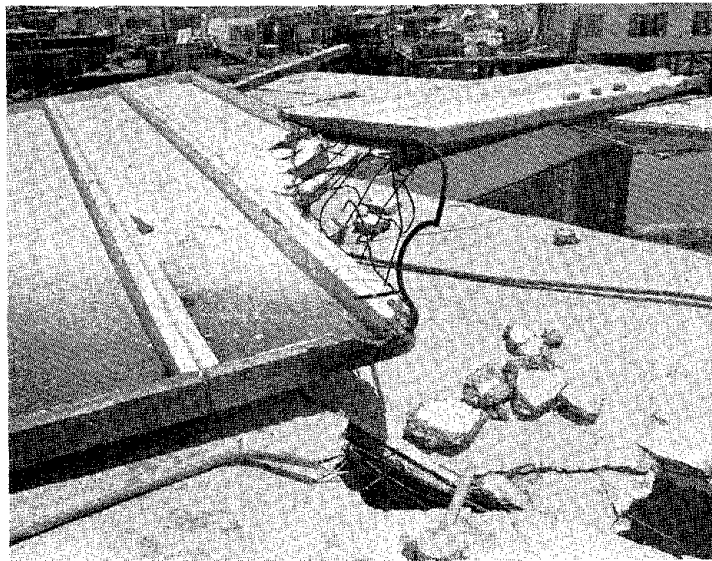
Overturned ceiling panels - CGI cladding and roof framing completely removed.
